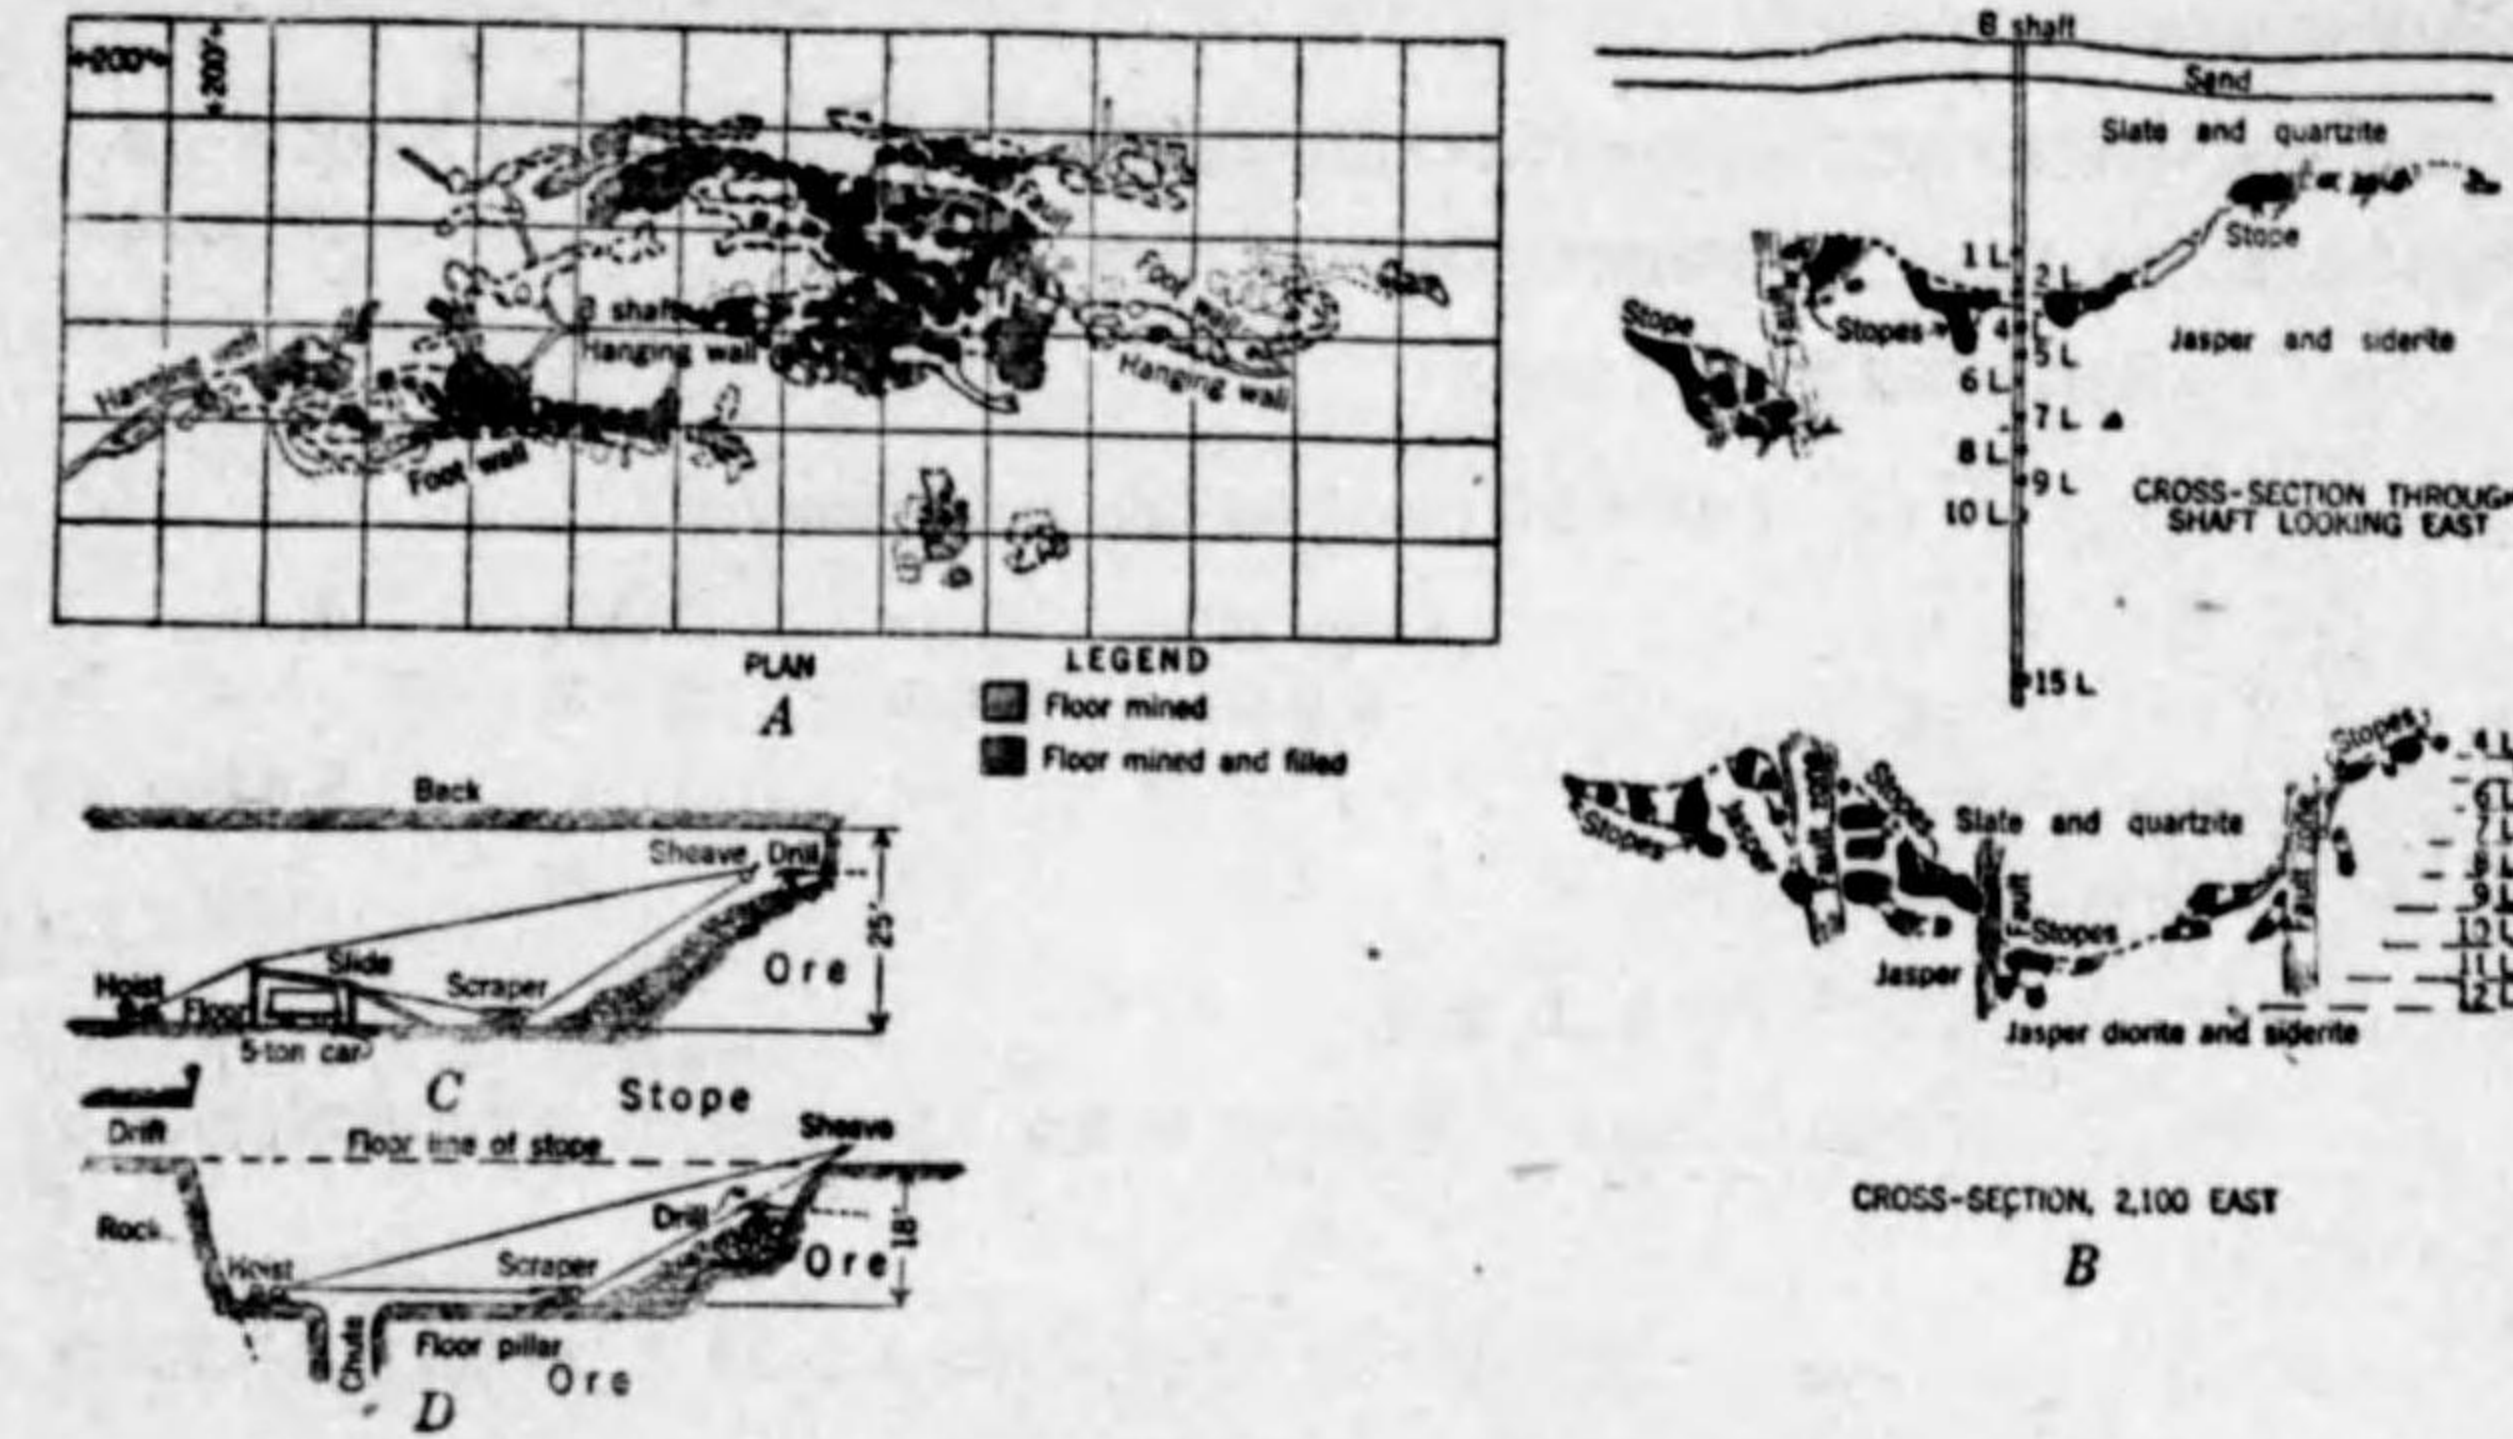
Open stoping at hard-ore mine, Marquette range, Michigan. A, Plan of ore bodies on second level; B, north-south cross sections; C, heading-and-bench breast stoping, scraping to car; D, removing floor pillar, Scraping to chute.
